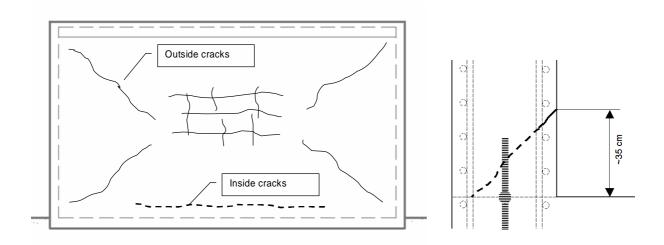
Left: sketch of outside cracking. Right: probable progress of the inside crack
